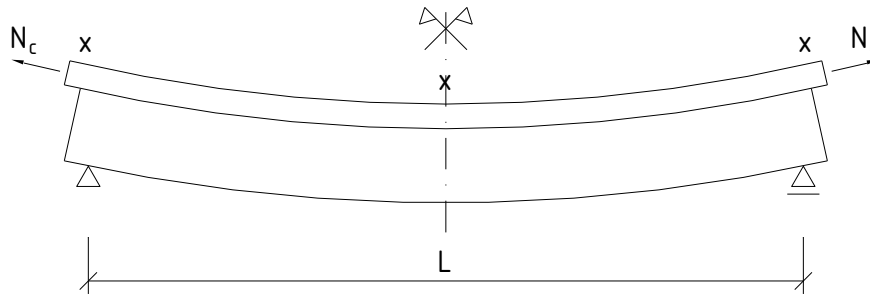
Slip of the concrete slab in case of absence of shear connection
